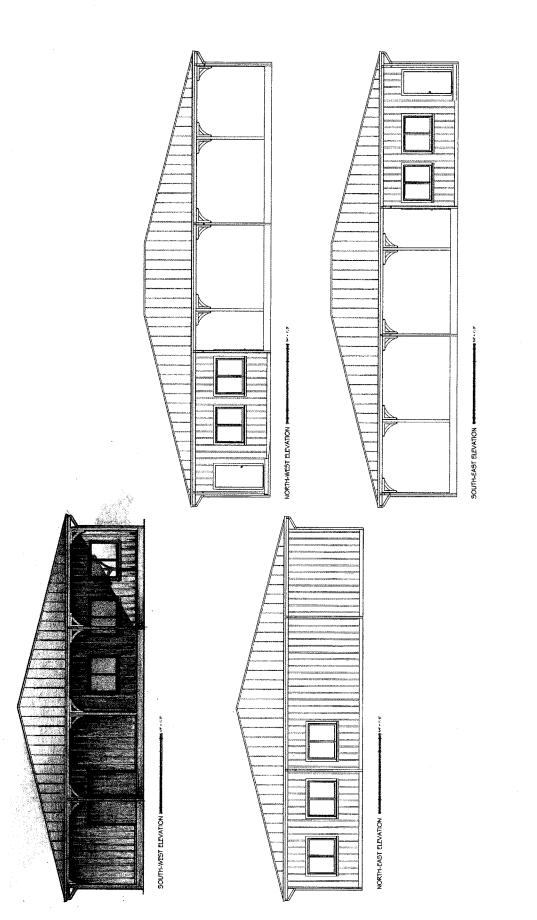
Exhibit F Architectural Elevations - Pool House PD 06-012 & CUP 07-005 (Fox Hollow Sports Facility) N IN IS
